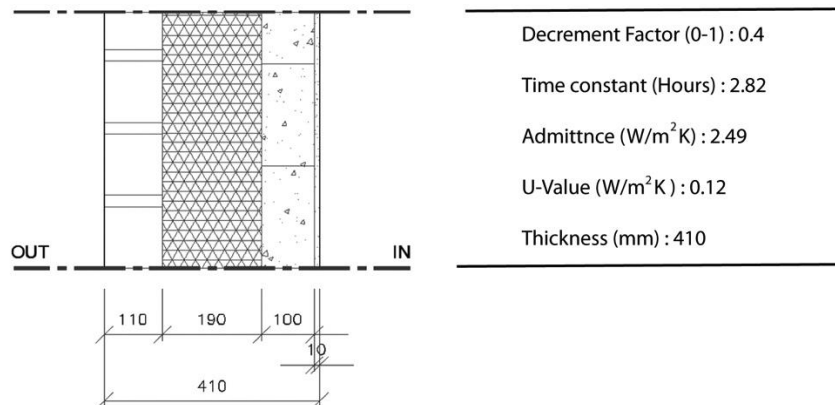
From Out to in: 110mm Brick Outer Leaf, 190mm Phenolic Insulation, 100mm Aerated Concrete Block, 10mm Lightweight Plaster
